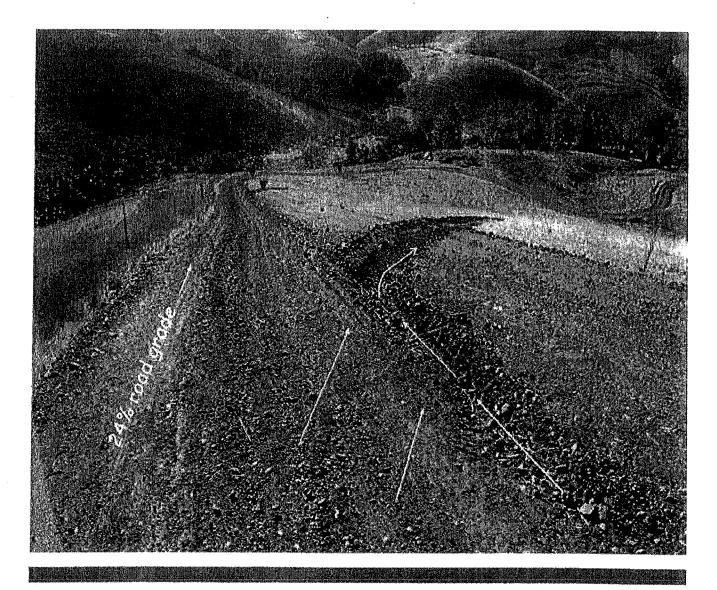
Steep roads that go straight up or down a hillside are very difficult to drain. This steep, fall line road developed a through cut cross section that was drained using lead out disches to direct runoff off the road and onto the adjacent, vegetated hillside. The road was "outsloped" to drain runoff to the right side, and the lead out disch was hullt slightly steeper than the road grade, to be self-cleaning. Four lead out disches have been constructed at 100-foot intervals to the bottom of the hillside, handlook for forest, rance and sural space.
